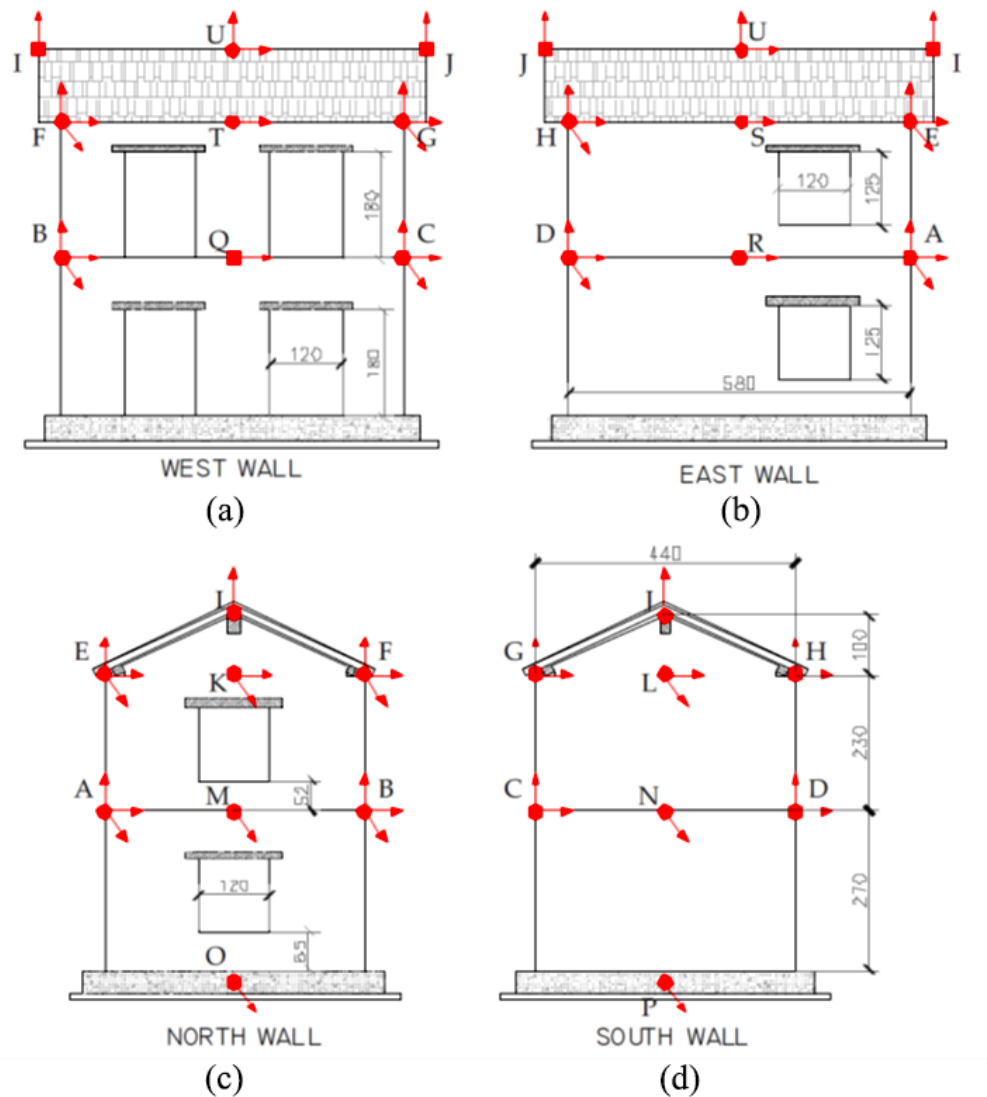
Drawings of Pavia Building 1 with the positions of accelerometers: (a) West wall. (b) East wall. (c) North wall. (d) South wall Magenes et al. (2010).
